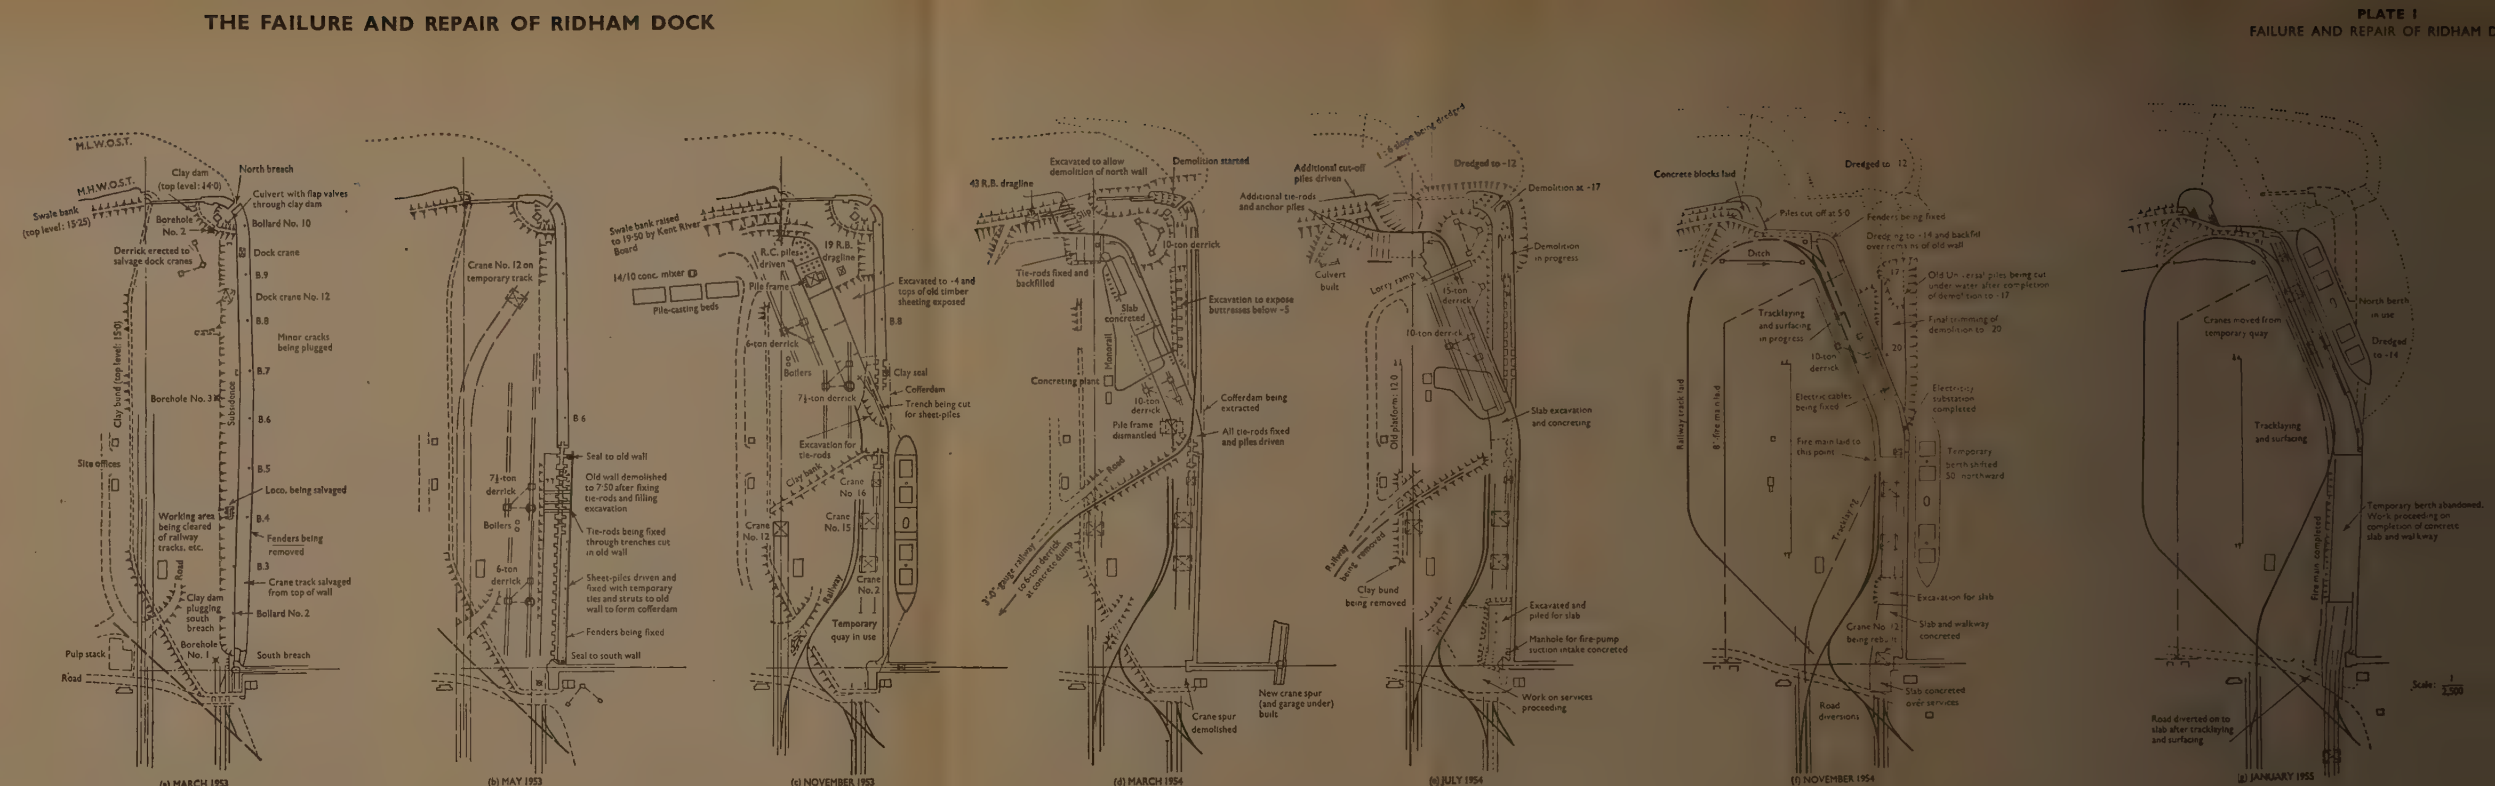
MAIN STAGES OF REPAIR AND RECONSTRUCTION
